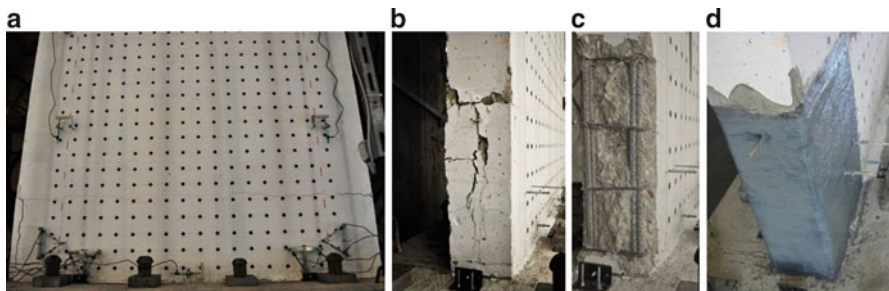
Damage to specimen no. 1 after quasi-static cyclic test: (a) flexural crack across the ends of the long dowels and splitting crack along the lap-splice at the *left edge*; (b) damaged lap-splice region at one edge of the wall; (c) lap-spliced bars without the spalled or loose cover; (d) CFRP jacket around wall edge (*specimen shown rotated, as if it were vertical*)
